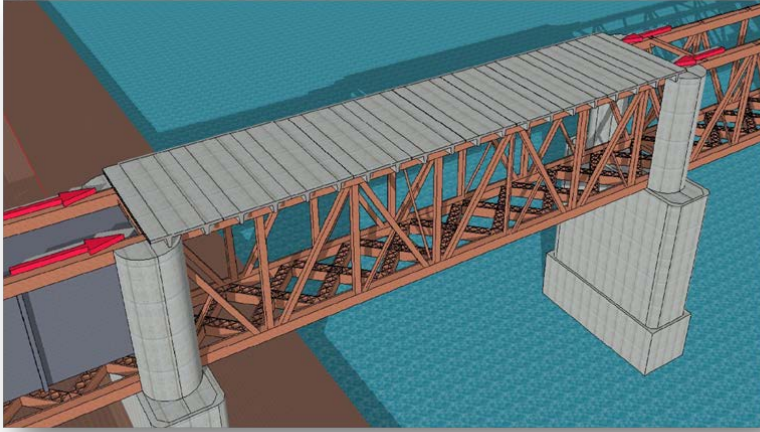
Deck Truss and Plated Girder Deck Panels Post-tensioning
